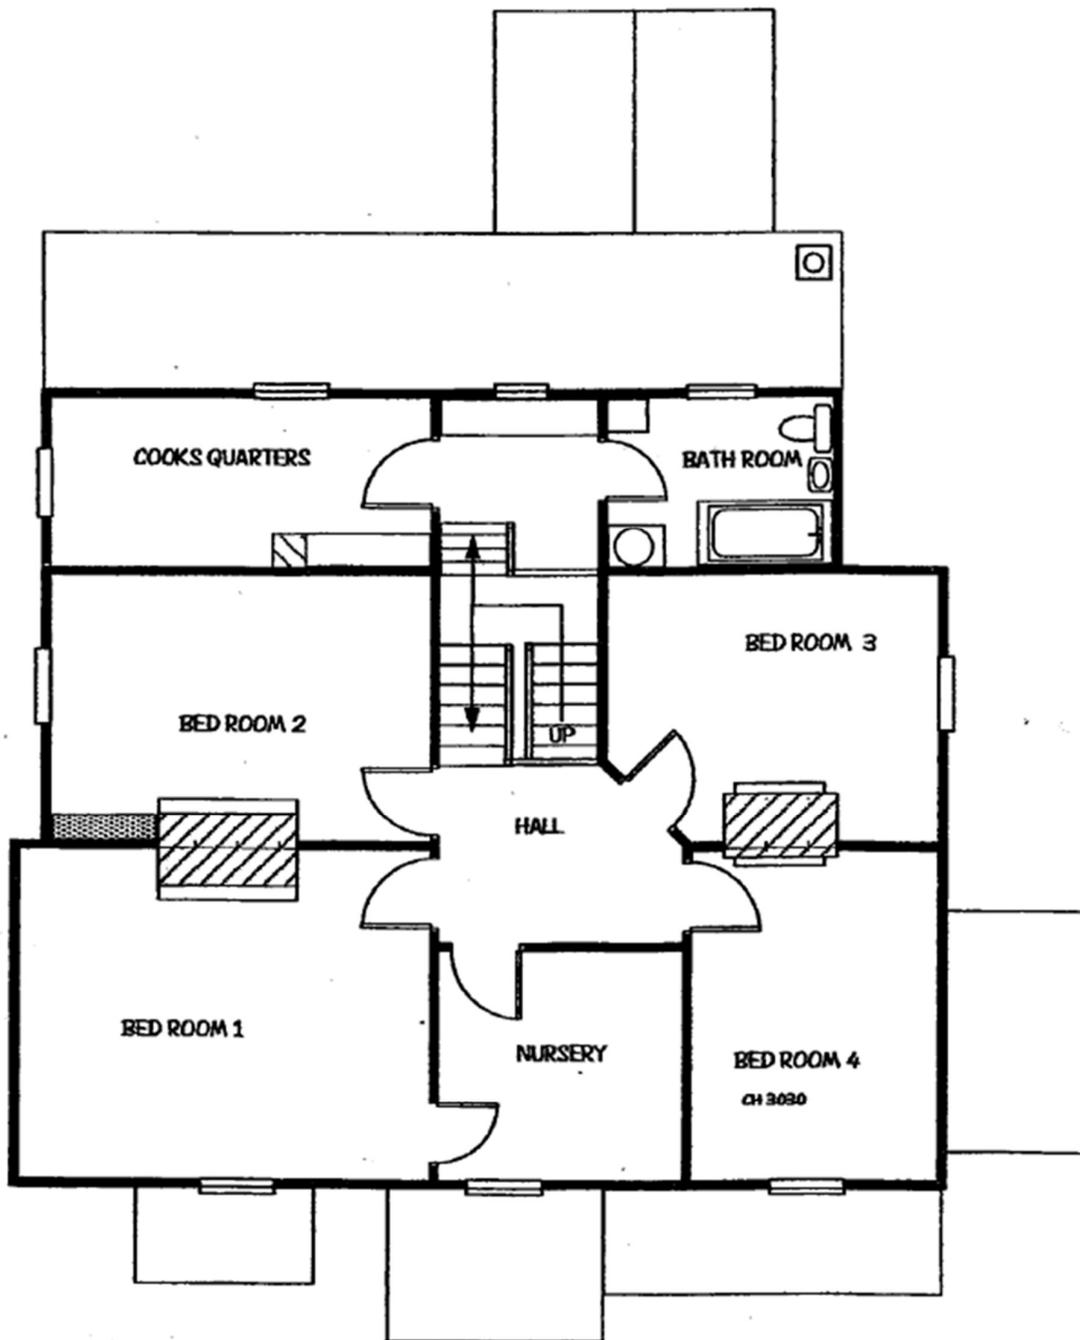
First Floor Plan, 'Hurston, 1 Mersey Street, Island Bay Wellington', ID 646048, Series 00736-326, Wellington City Archives
